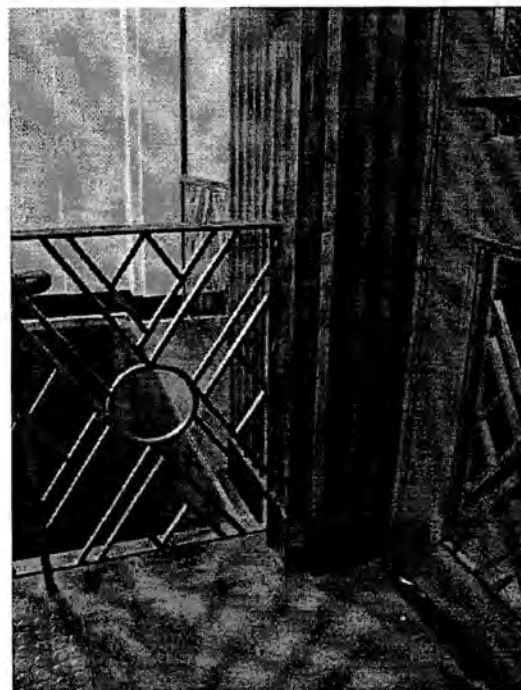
fluted wood column and ornamental metal panels at Entry Vestibule balustrade and door.
